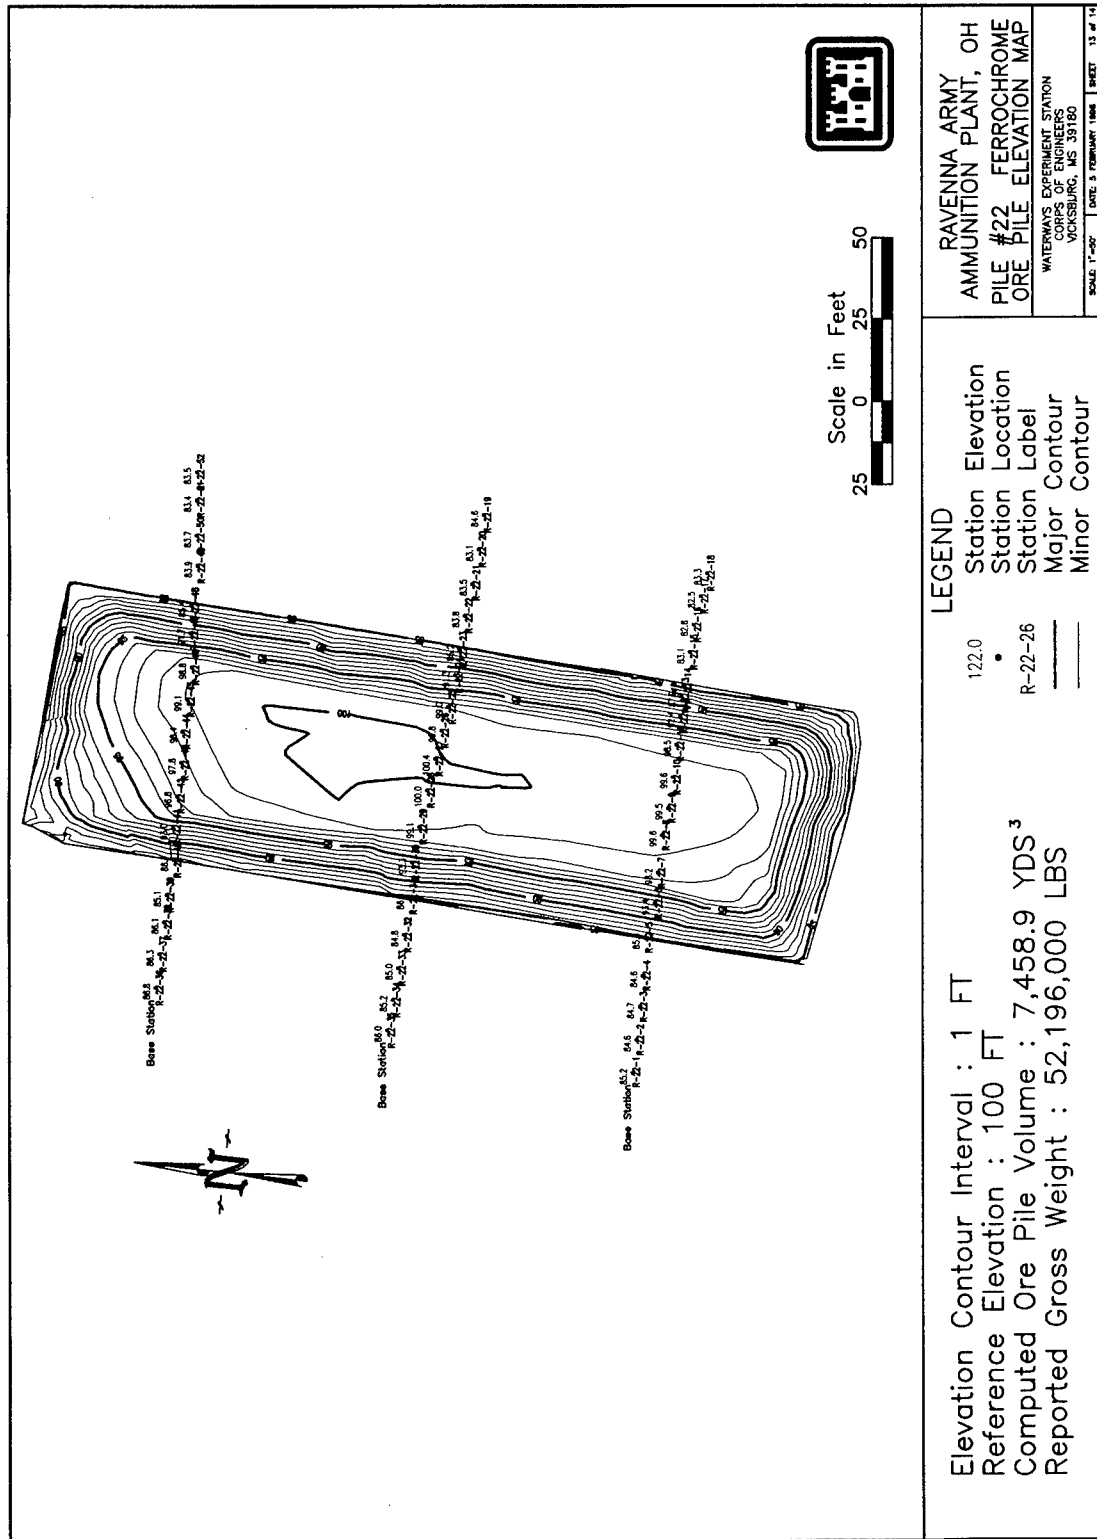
Pile #22, Ravenna Army Ammunition Plant, OH
